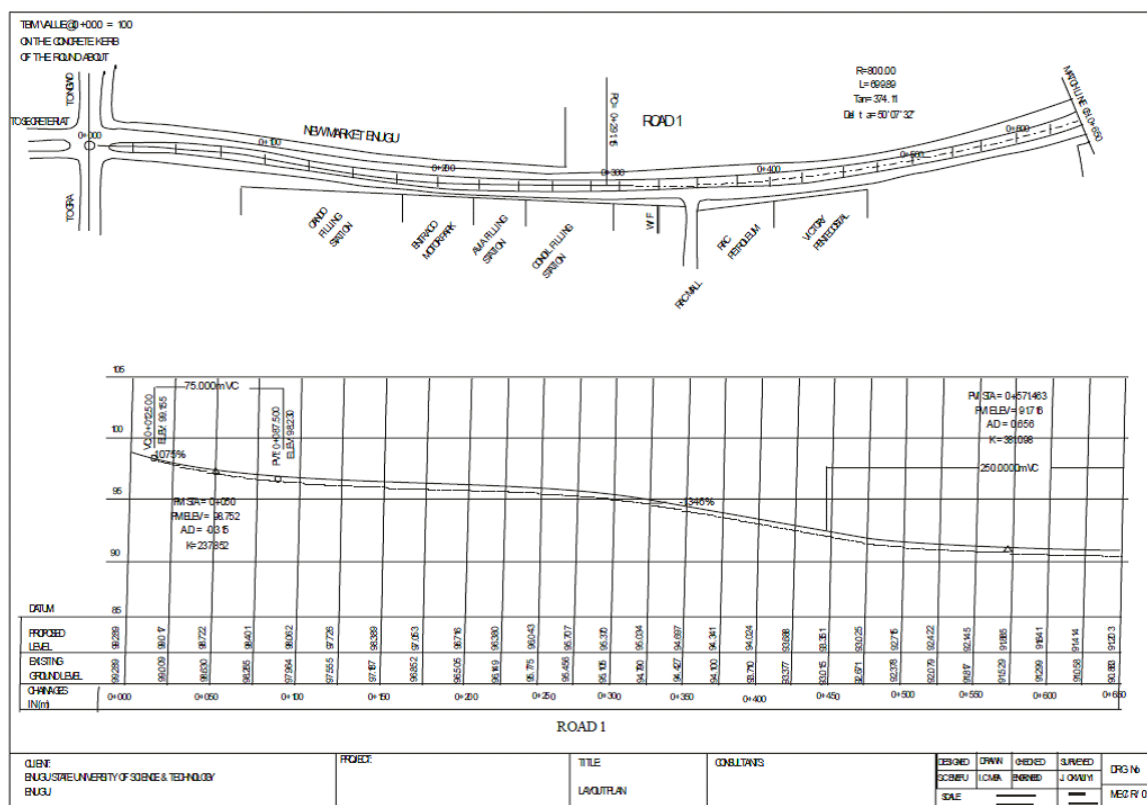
Typical planning survey for optic fibre Installation route along existing road.
